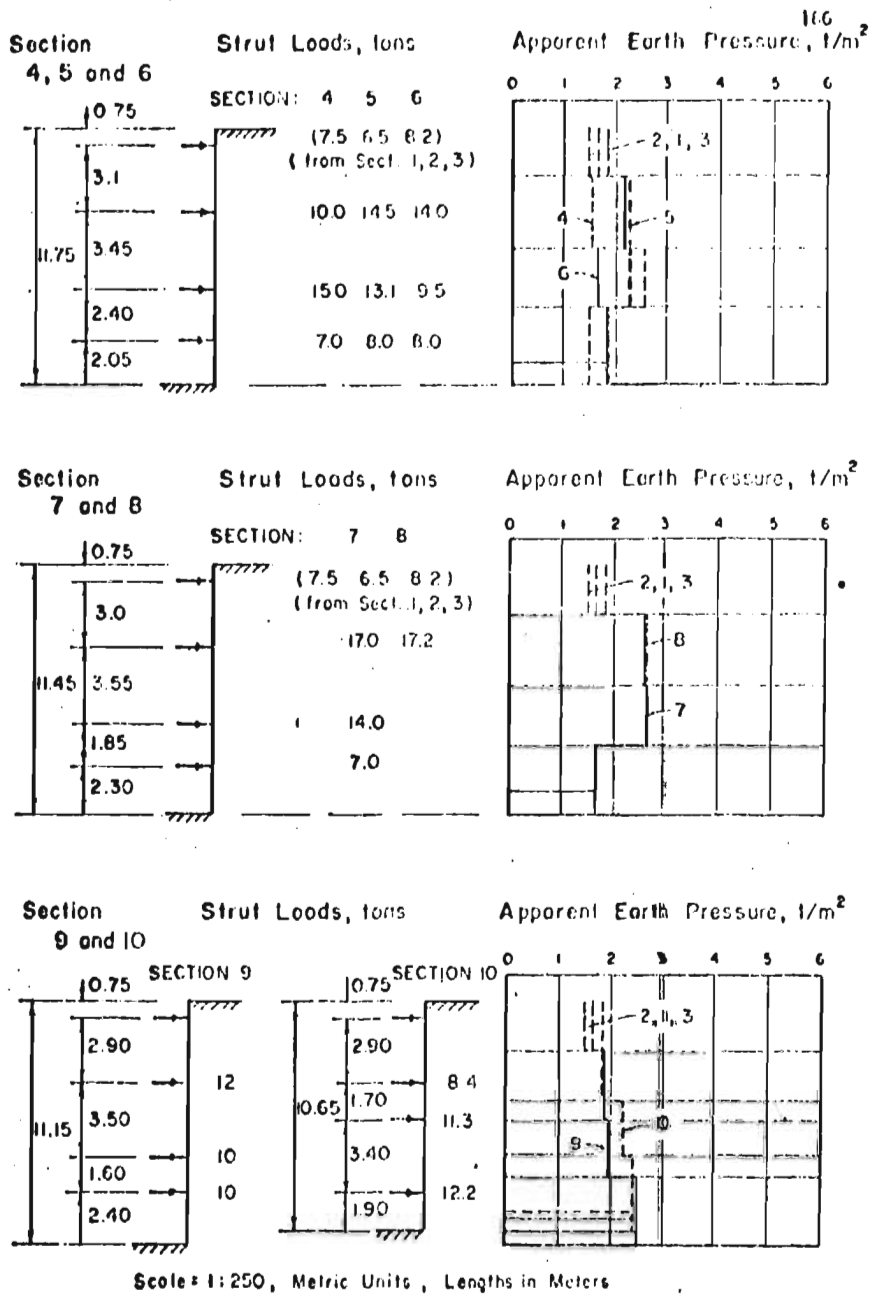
Berlin Subway, Strut loads and apparent earth pressure.
